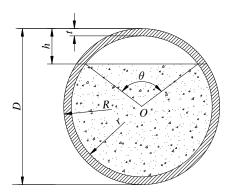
Schematic diagram of void cross-section of concrete filled steel tube
